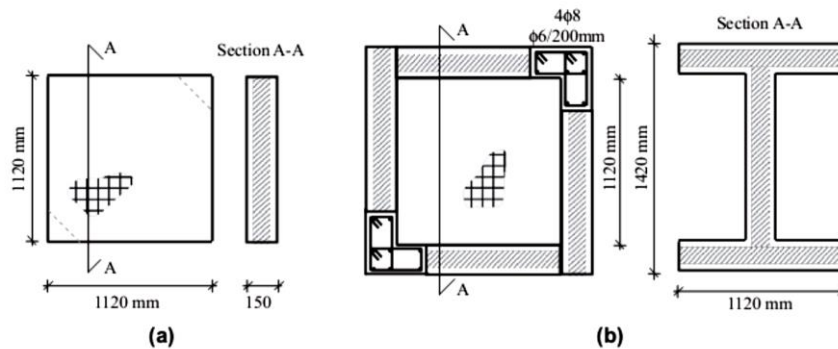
1: a) Wall Panel b) Transversally stiffened panel. (Gara et al., 2012)
